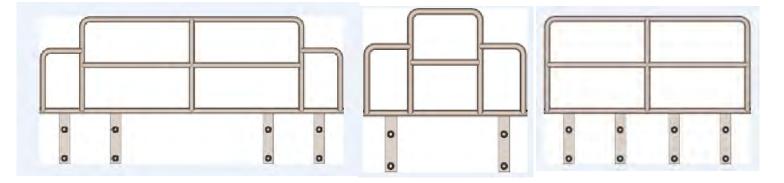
PHOTO SHOWING THE EZ DOCK STEPPED RAILING SYSTEM. A MINIMUM OF 25% OF THE RAILING ON THE FISHING PLATFORM WILL BE LOWERED FOR IMPROVED ACCESS TO THE WATER. SMALL GAPS BETWEEN RAILING SECTIONS WILL AID IN RETRIEVING A CAUGHT FISH.
